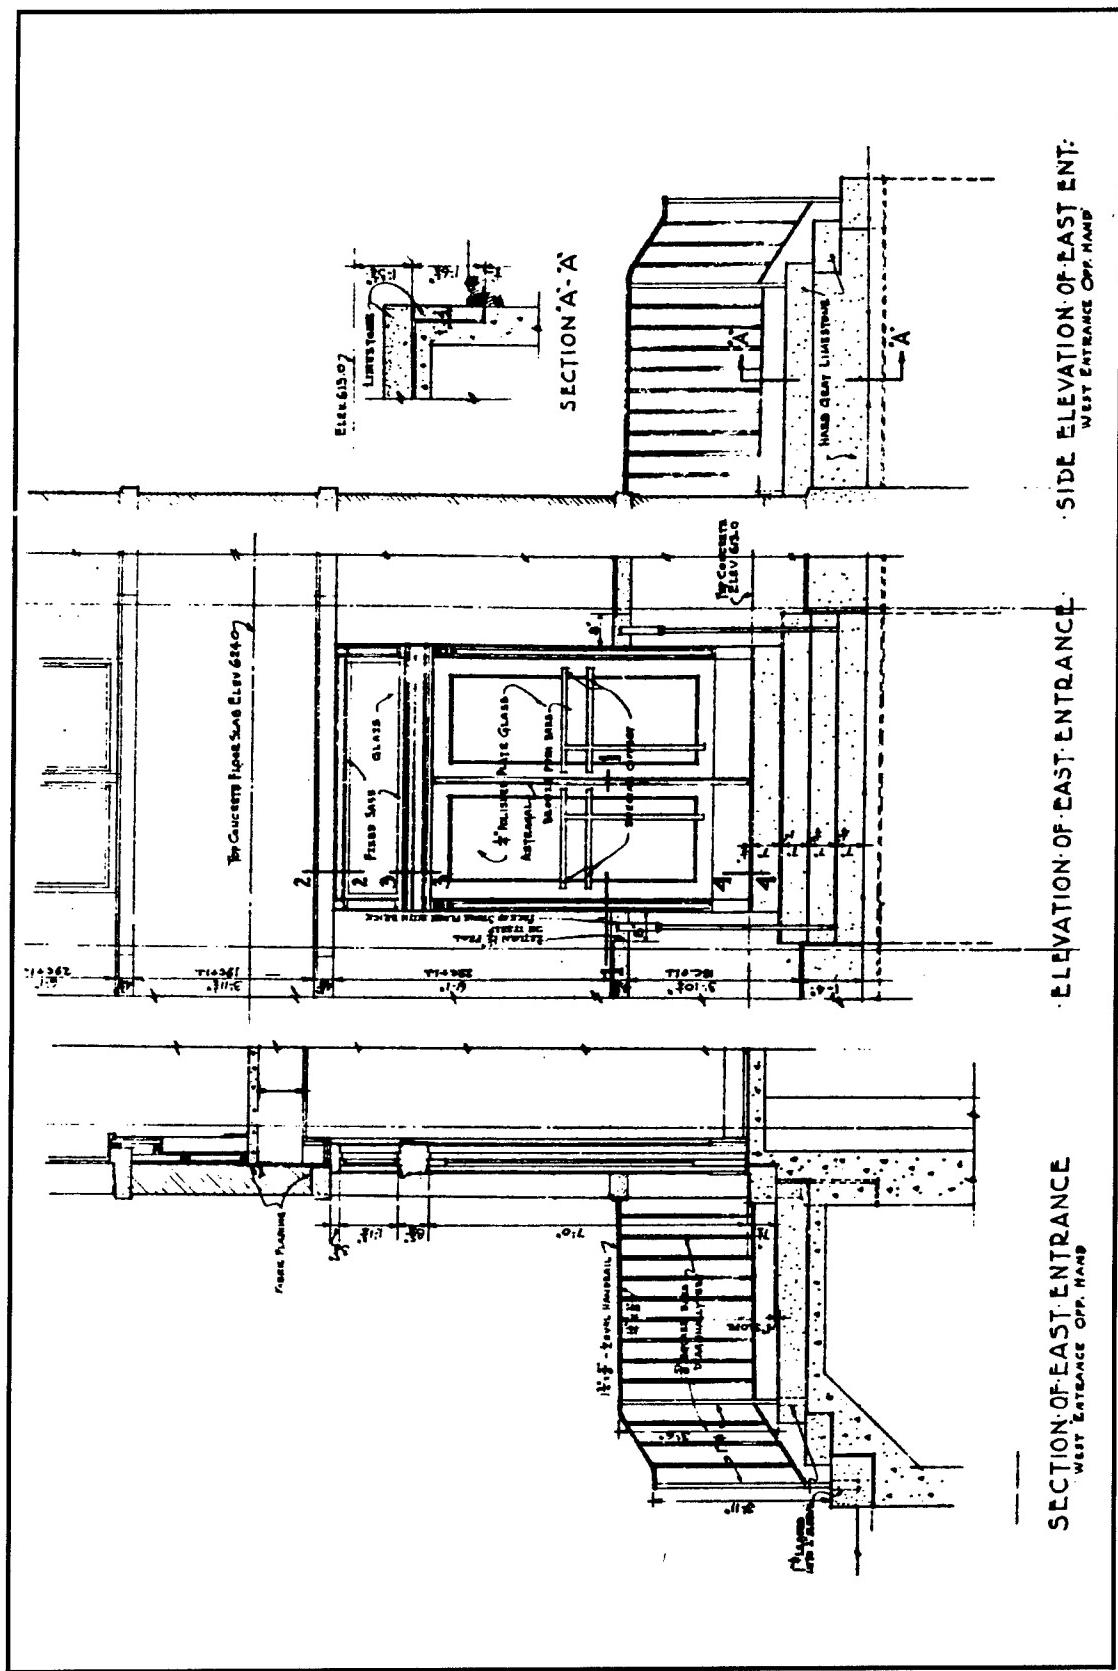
East entrance elevation, Administration Building (Building 703), Indiana Ordnance Works Plant 1 (INAAP Drawing W-45918).
